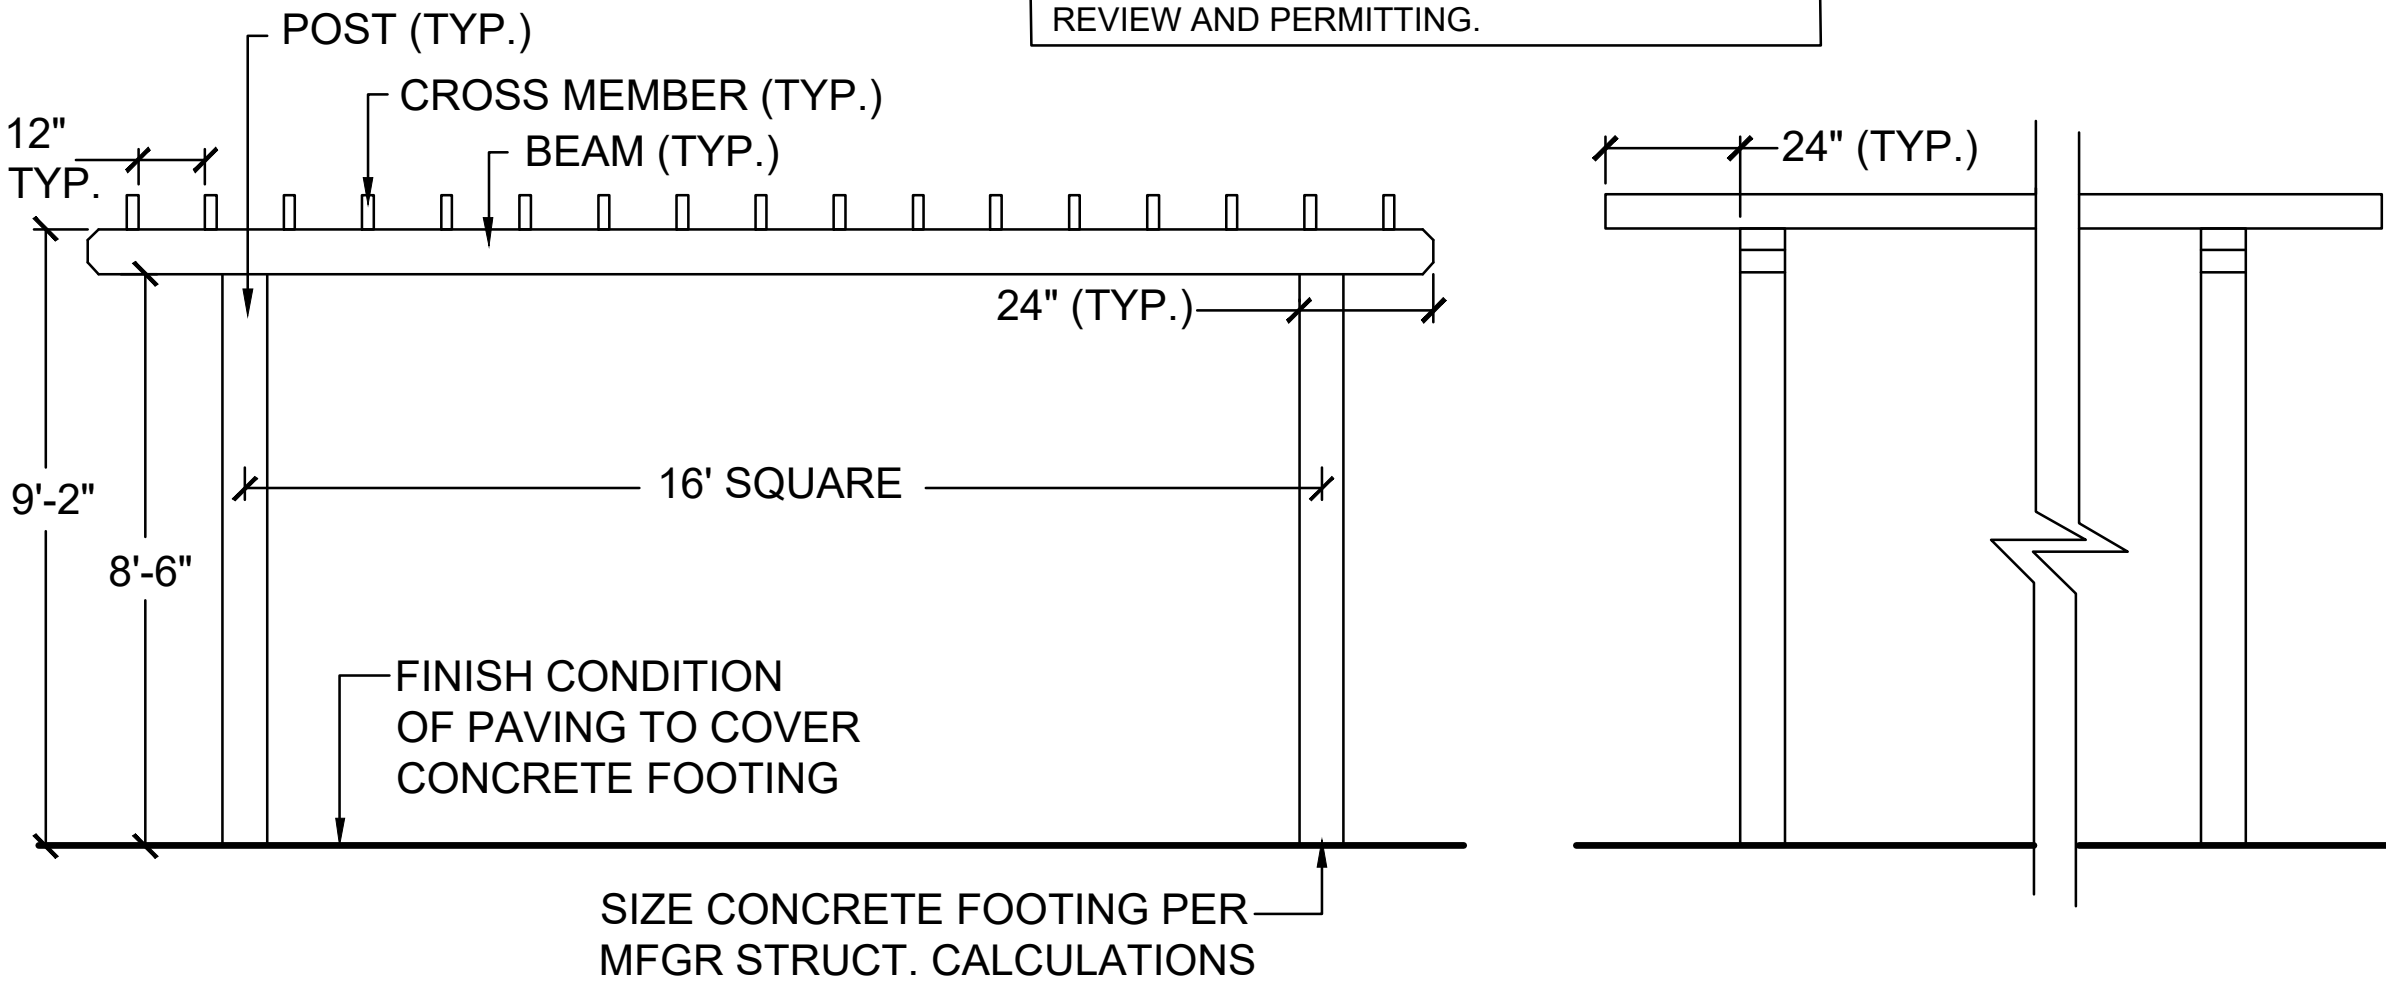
DETAIL FOR REFERENCE ONLY. SHOP DRAWINGS REQUIRED FOR OWNER / LANDSCAPE ARCHITECT APPROVAL. PROVIDE STRUCTURAL DRAWINGS AND DETAILS FOR REVIEW AND PERMITTING.
